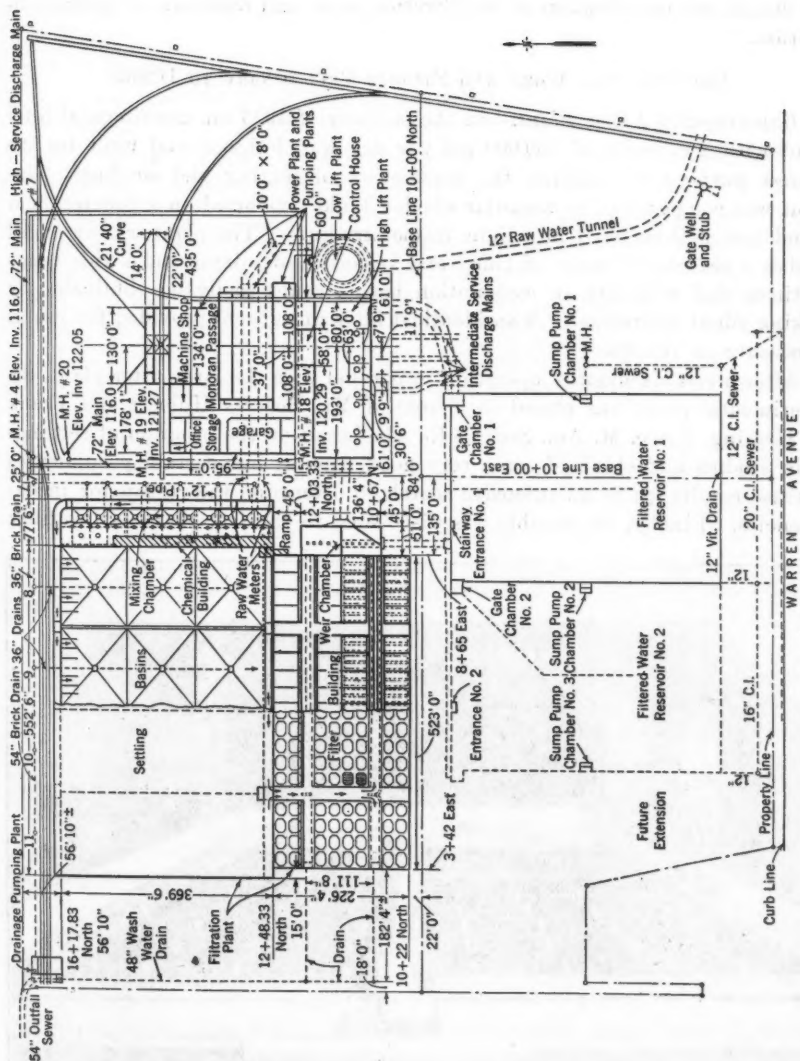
GENERAL PLAN, FILTRATION PLANT, SPRINGWELLS STATION
